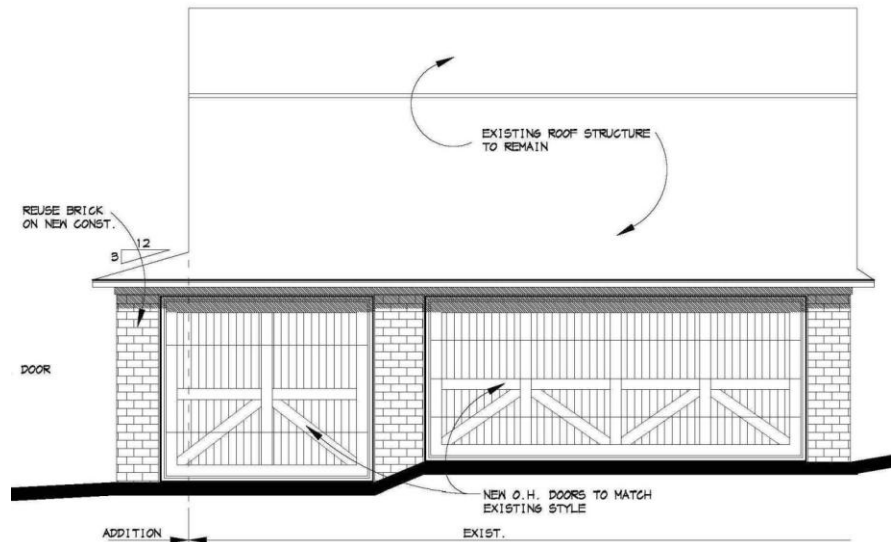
541 Highland Ave., proposed north elevation, 2015.
